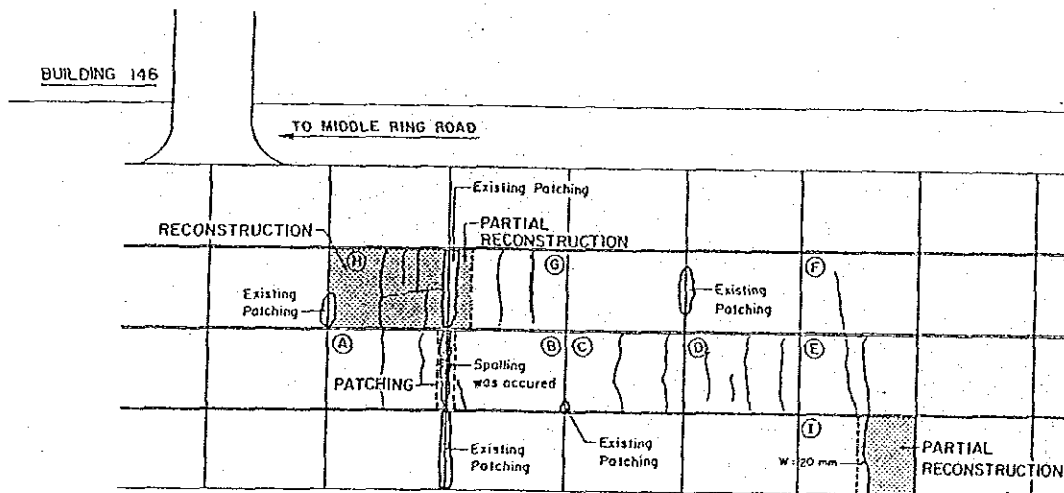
Pavement Condition and Rehabilitation Method at Nang Linchi Road
